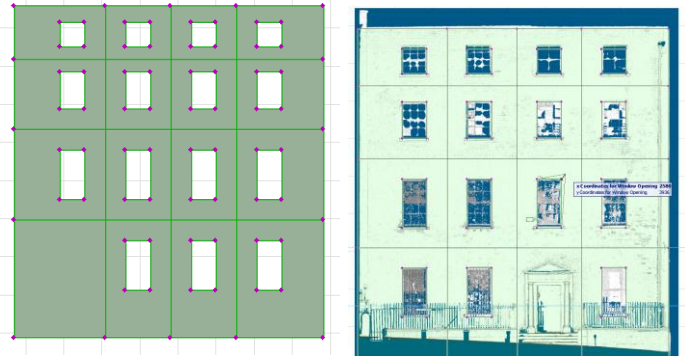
Wall façade with editable points marked (left) & Wall façade overlaid with survey data (right)
